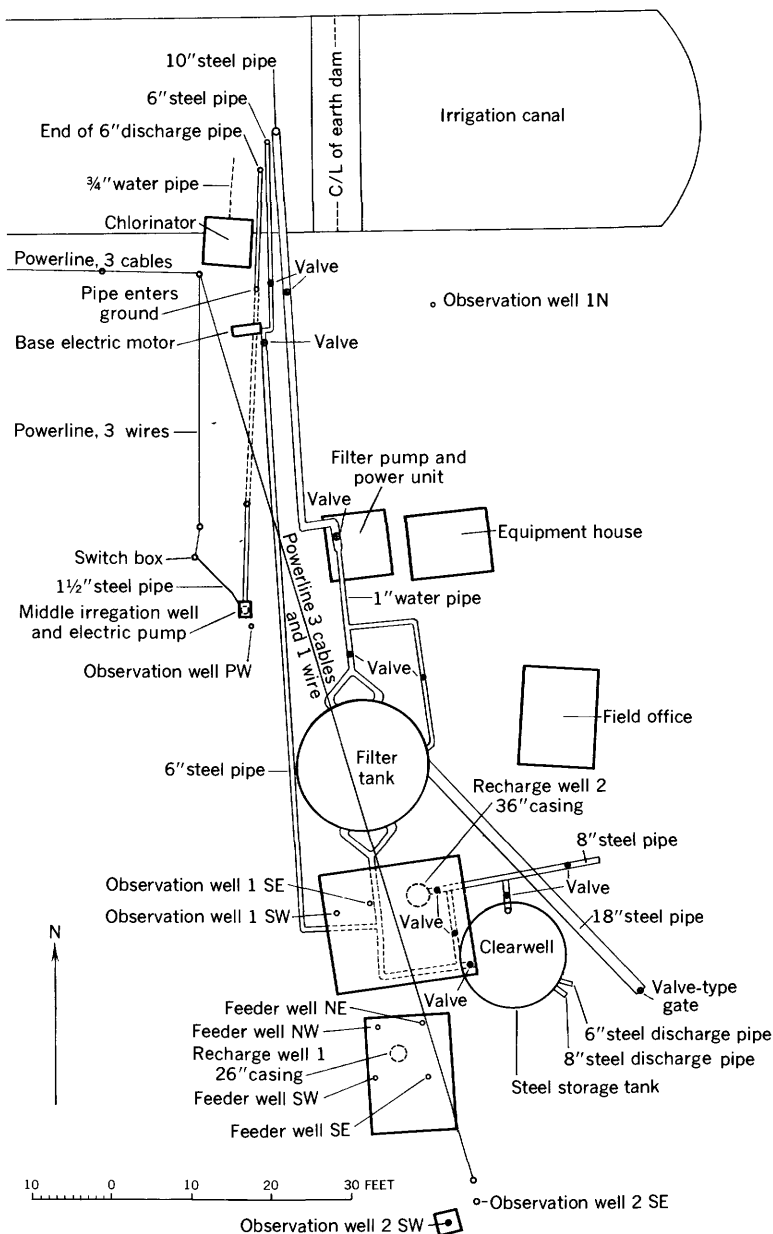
Map of the artificial-recharge site showing layout of equipment.
